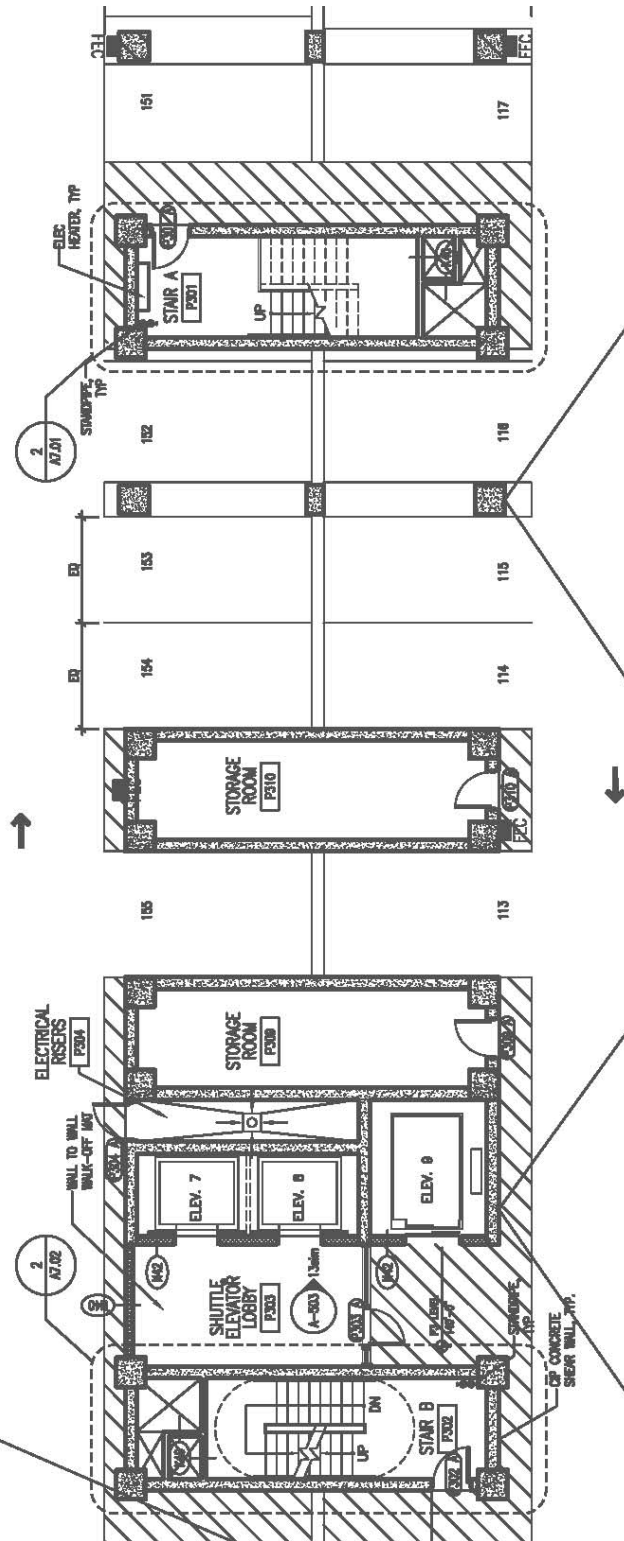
Revised Parking Garage P3 Level Service Core Plan
